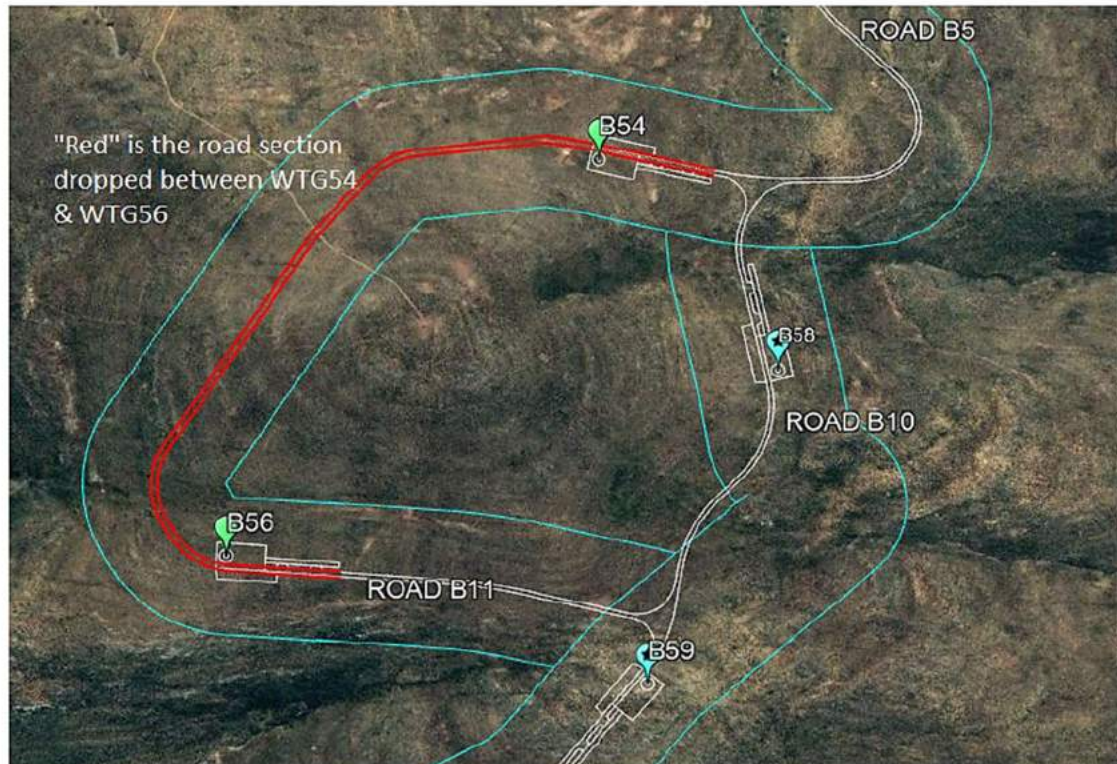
5: Dropping of road between B54 and B56 (Red – approved layout, White - proposed Realignment of road B11, blue the approved 200m road corridor DEA reference 14/12/16/3/3/2/900– dated 23 November 2016)
